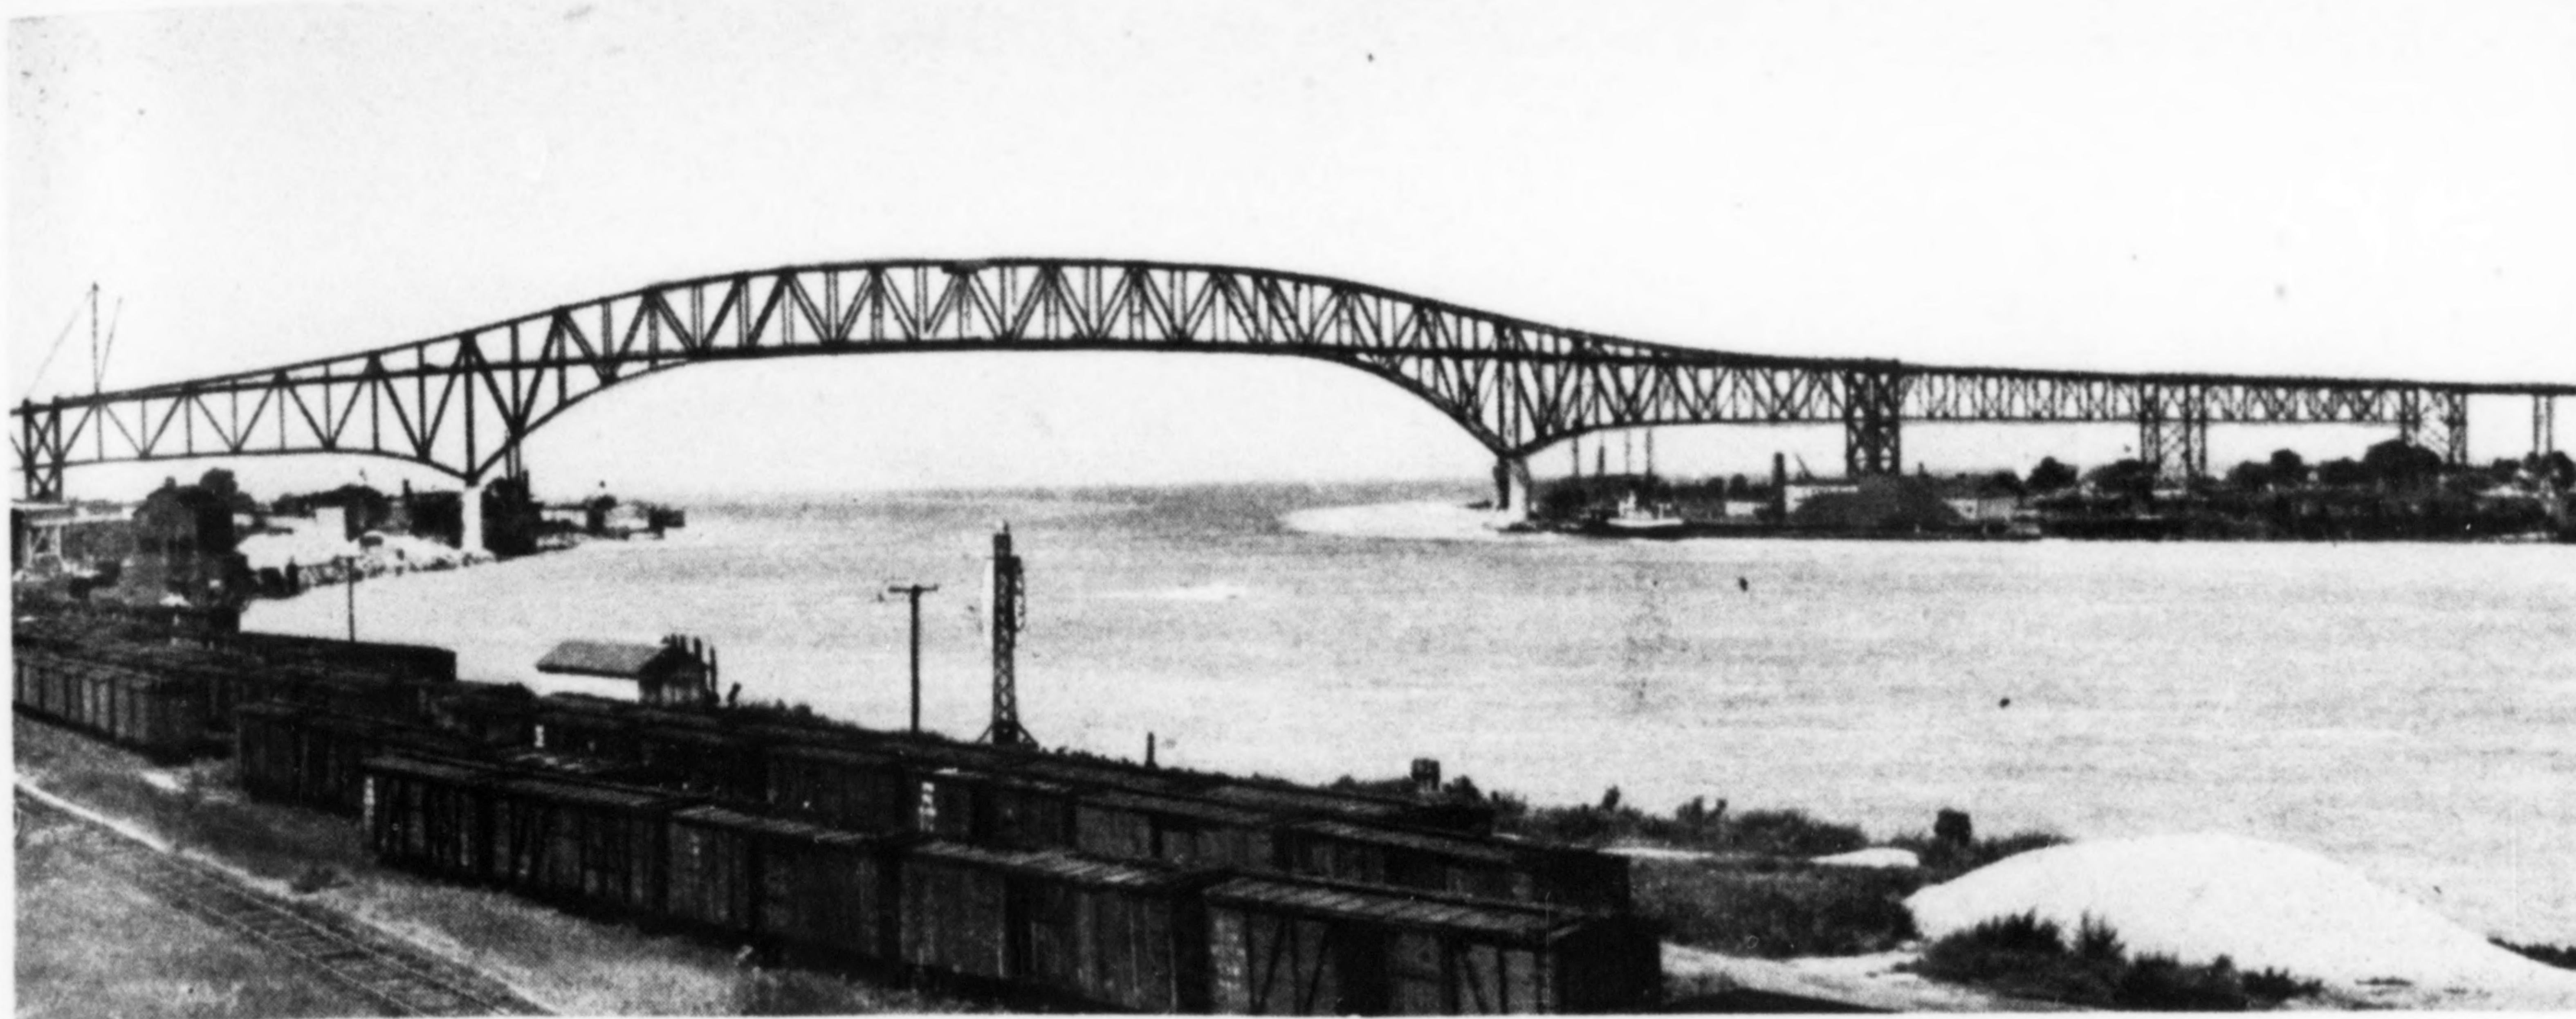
Providing 150-ft. clearance over the St. Clair River, the Bluewater Bridge presents an interesting outline featured by a flat-arch cantilever central span and steel framed anchor towers.
